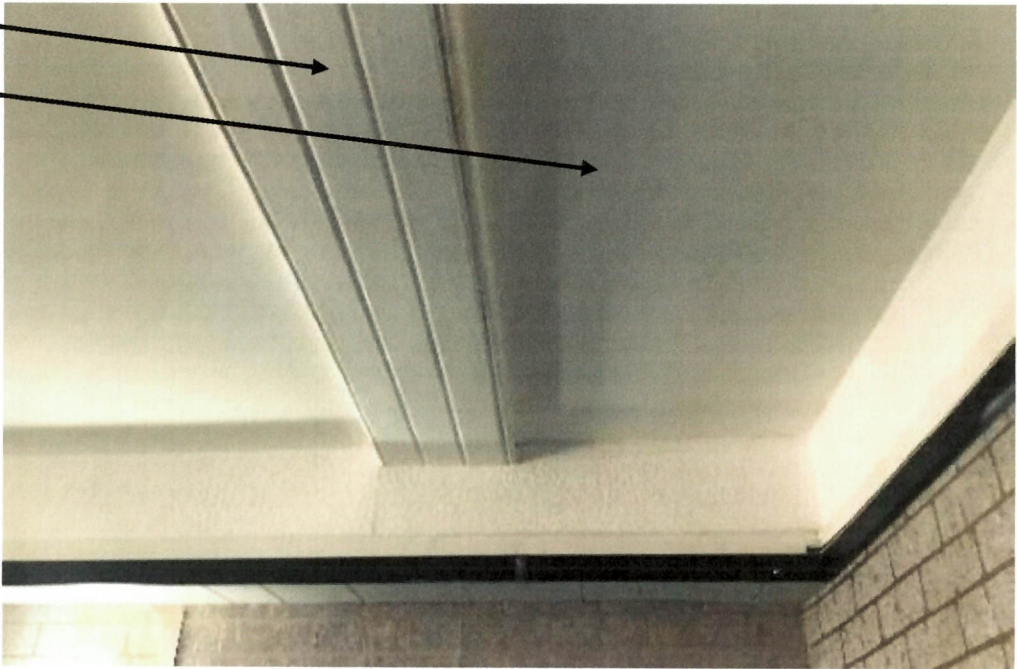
(d): lowered ceiling detail of main bar area (15/07/24)
